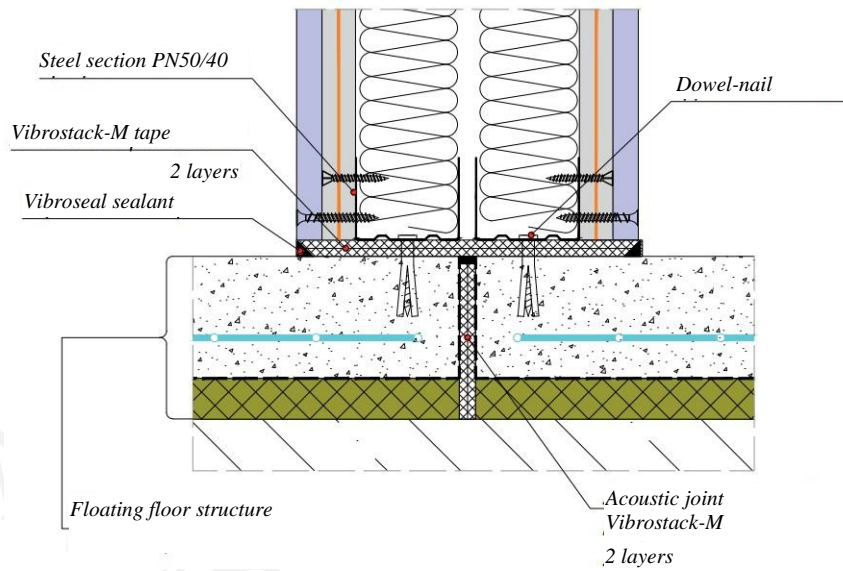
Connection of double-frame soundproofing partition to floating floor structure.
